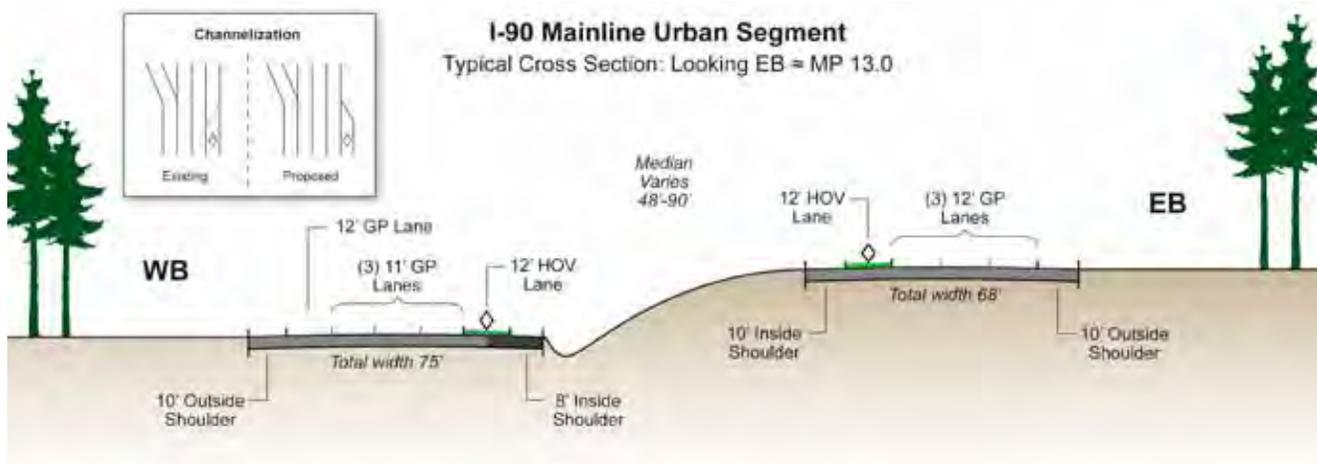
Westbound Auxiliary Lane – Widen Roadway to Full Standards
